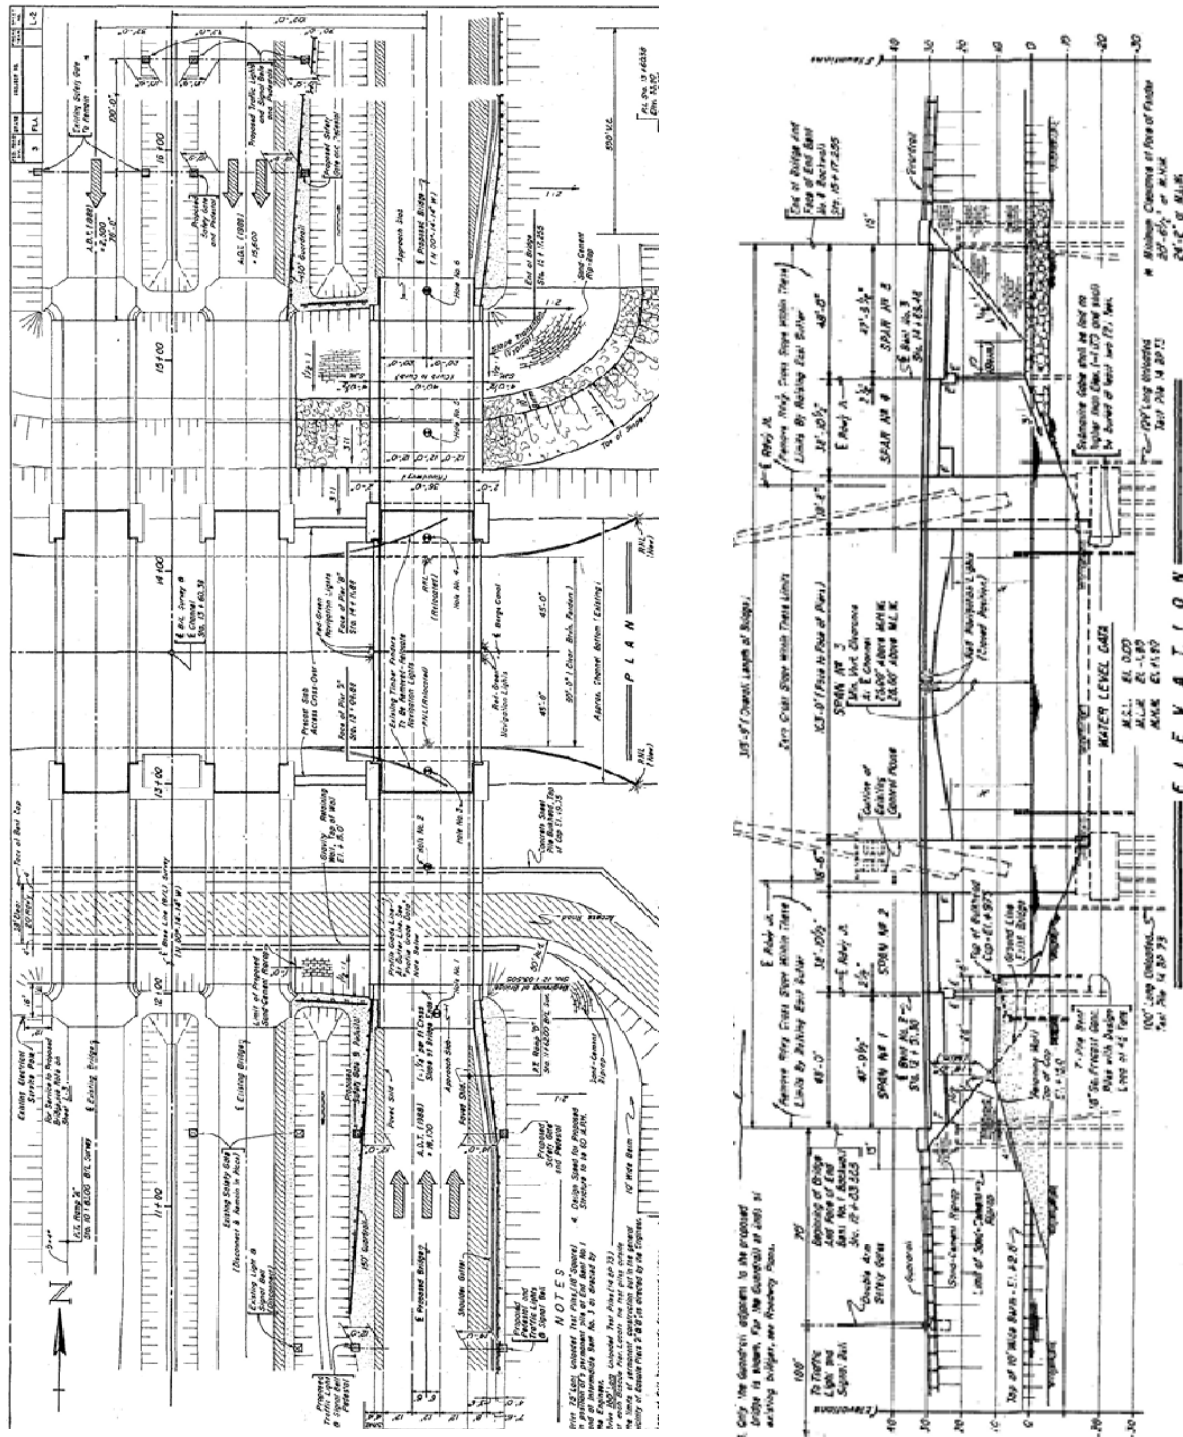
S.R. 401 Bridges Plan and Elevation (Elevation Shown at NB Bridge)
